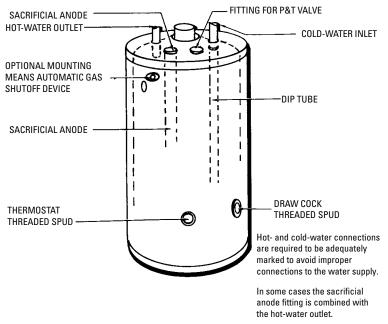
Typical water heater fittings. (Courtesy Robertshaw Controls Co.)
